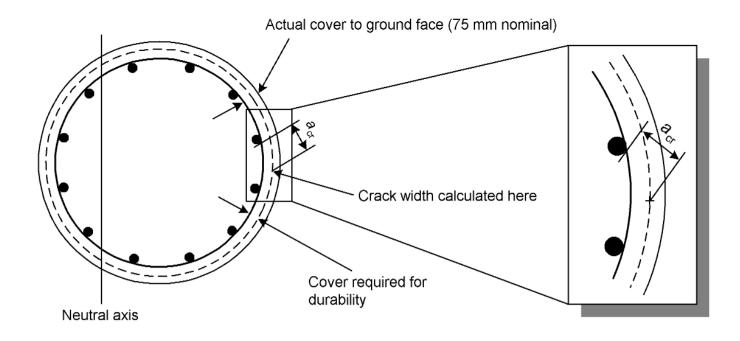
Pile cross section showing crack width calculation principles to BS 8110
